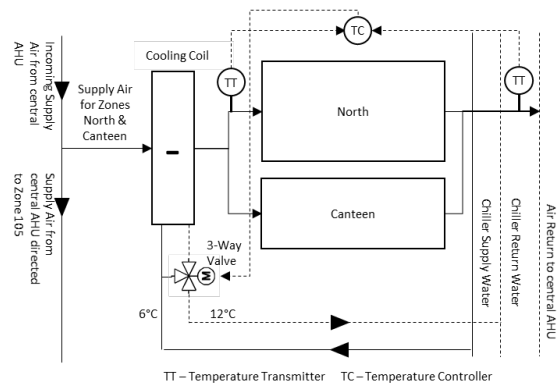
P&ID Breda office building - North and Canteen Zone
